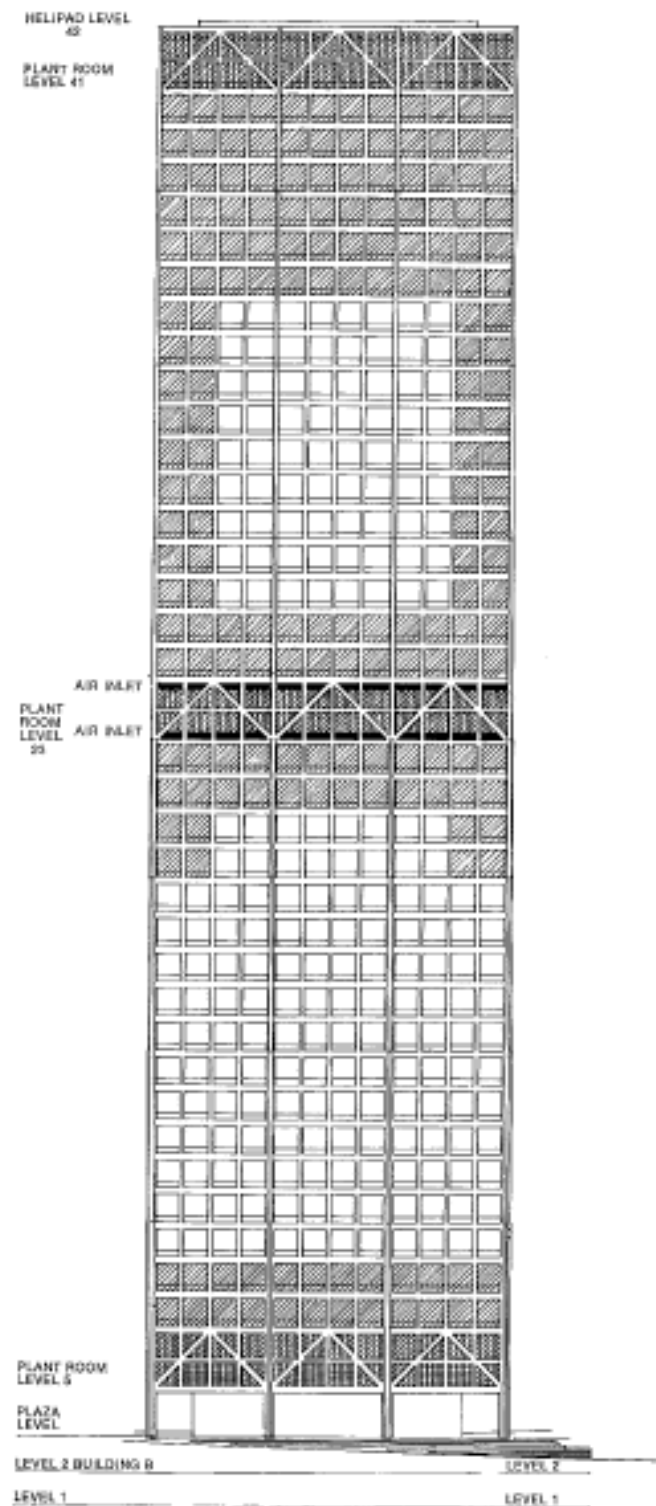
140 William Street building elevation view, from Thomas et al^[24].
